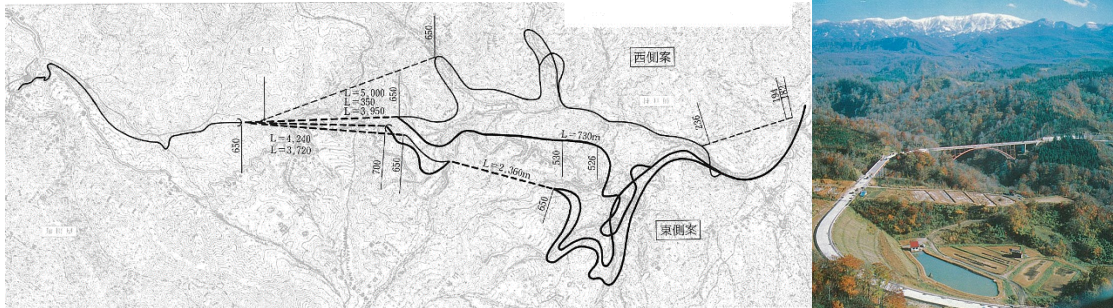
Roadway reconstruction planning of Gassan roadway (MLIT, Japan)
